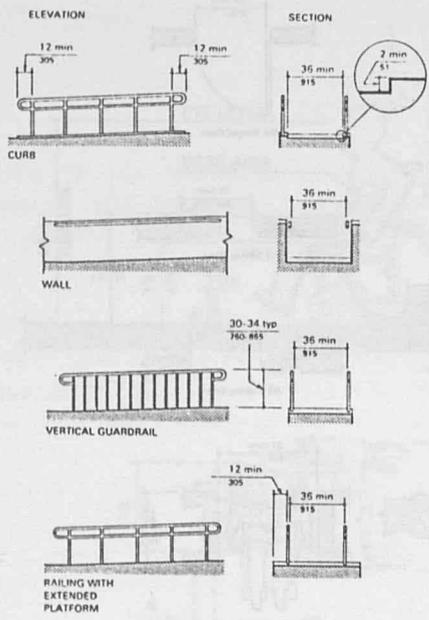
Ramps. ANSI, American National Standard for Buildings and Facilities, 1986.
